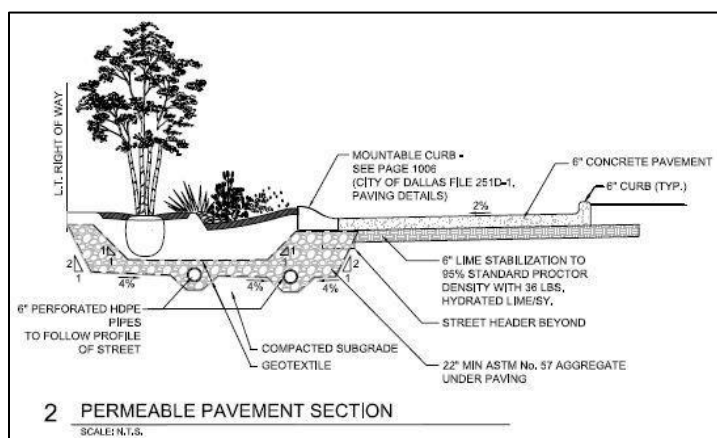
Plan details for a permeable pavement section of Congo Street, Dallas, Texas.
